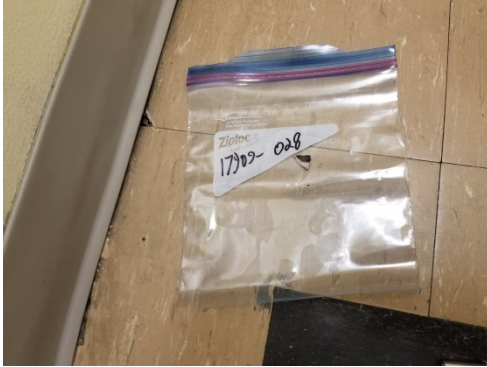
Grey duct sealant is ACM. (May 22, 2018)
